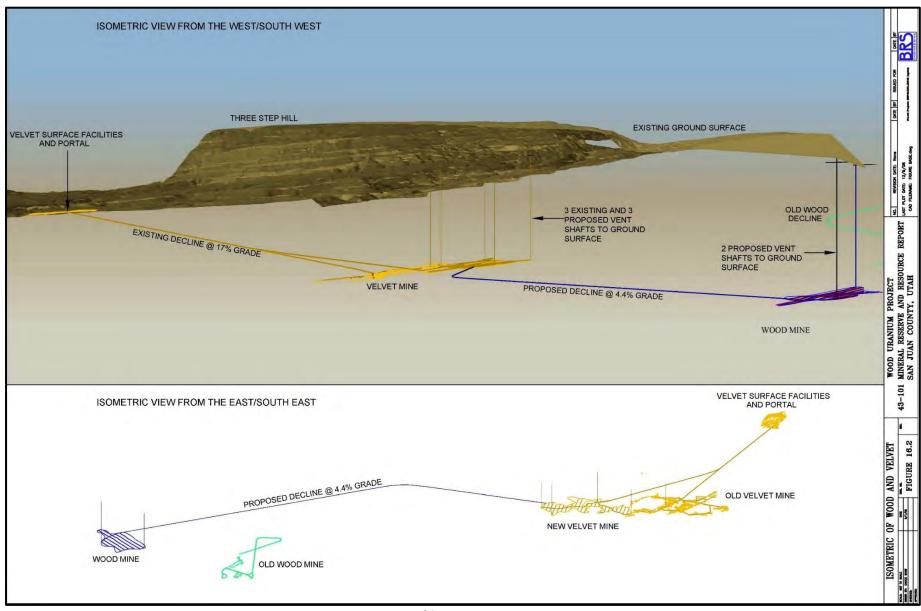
Isometric of Wood and Velvet Underground Mine Plan
